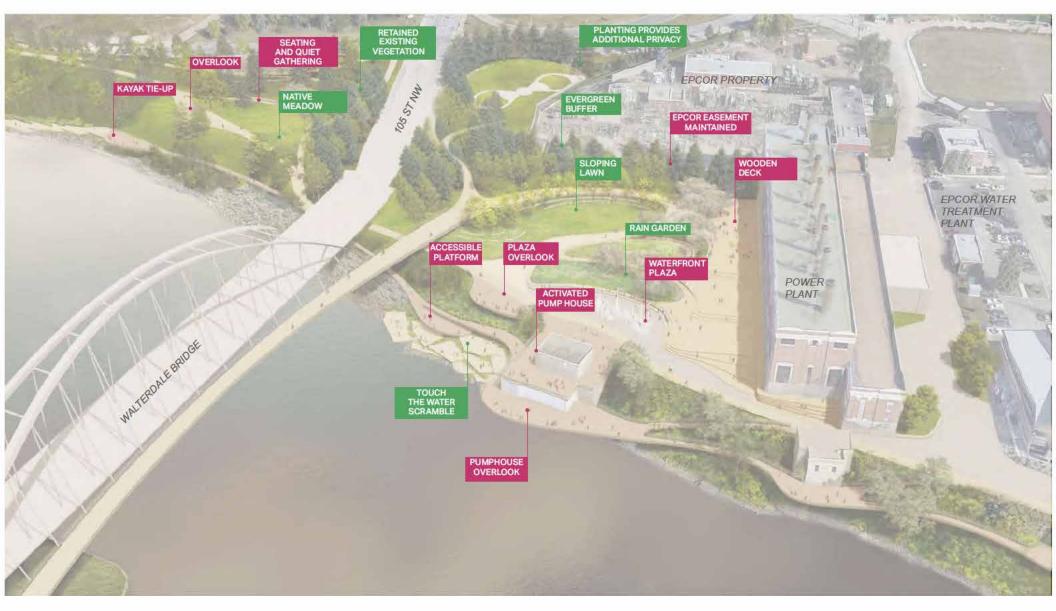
Rossdale Power Plant -Preferred Concept Elevation
